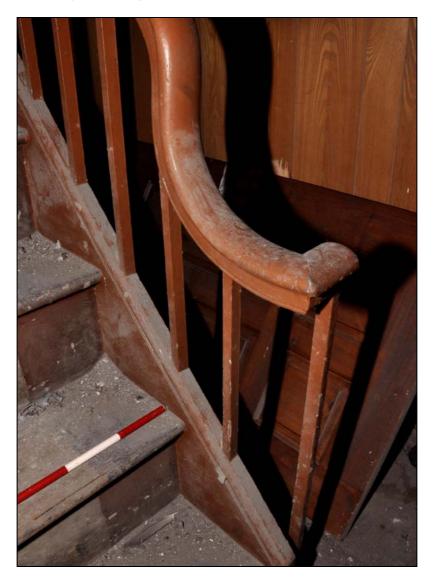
Building 1 - ramped handrail to staircase on first floor, phase 1
